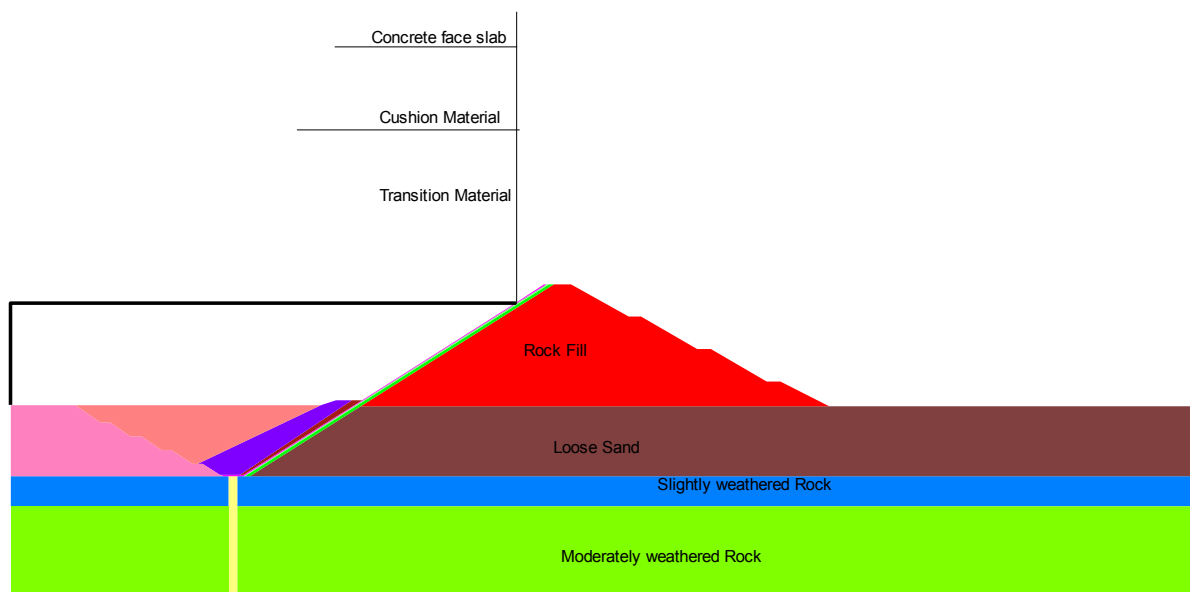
Zoning of Concrete Faced Rock Fill Dam
